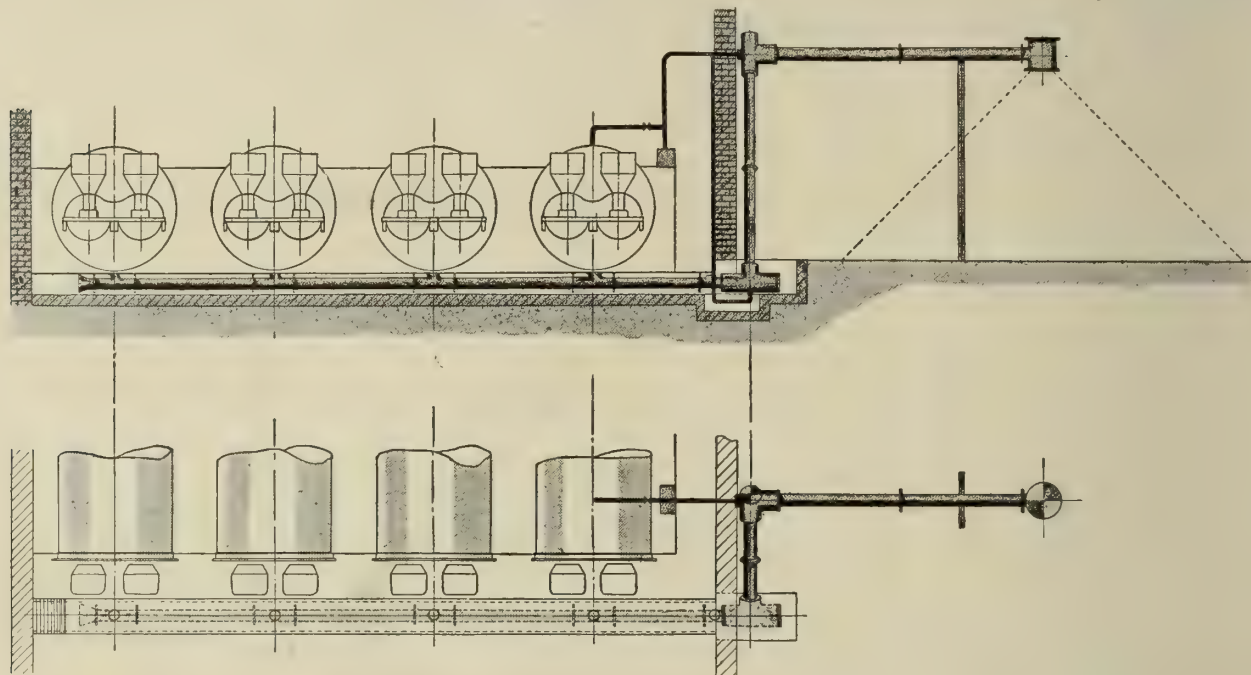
“Bennis” steam jet conveyor delivering ashes into heap in yard. Front elevation and plan.
